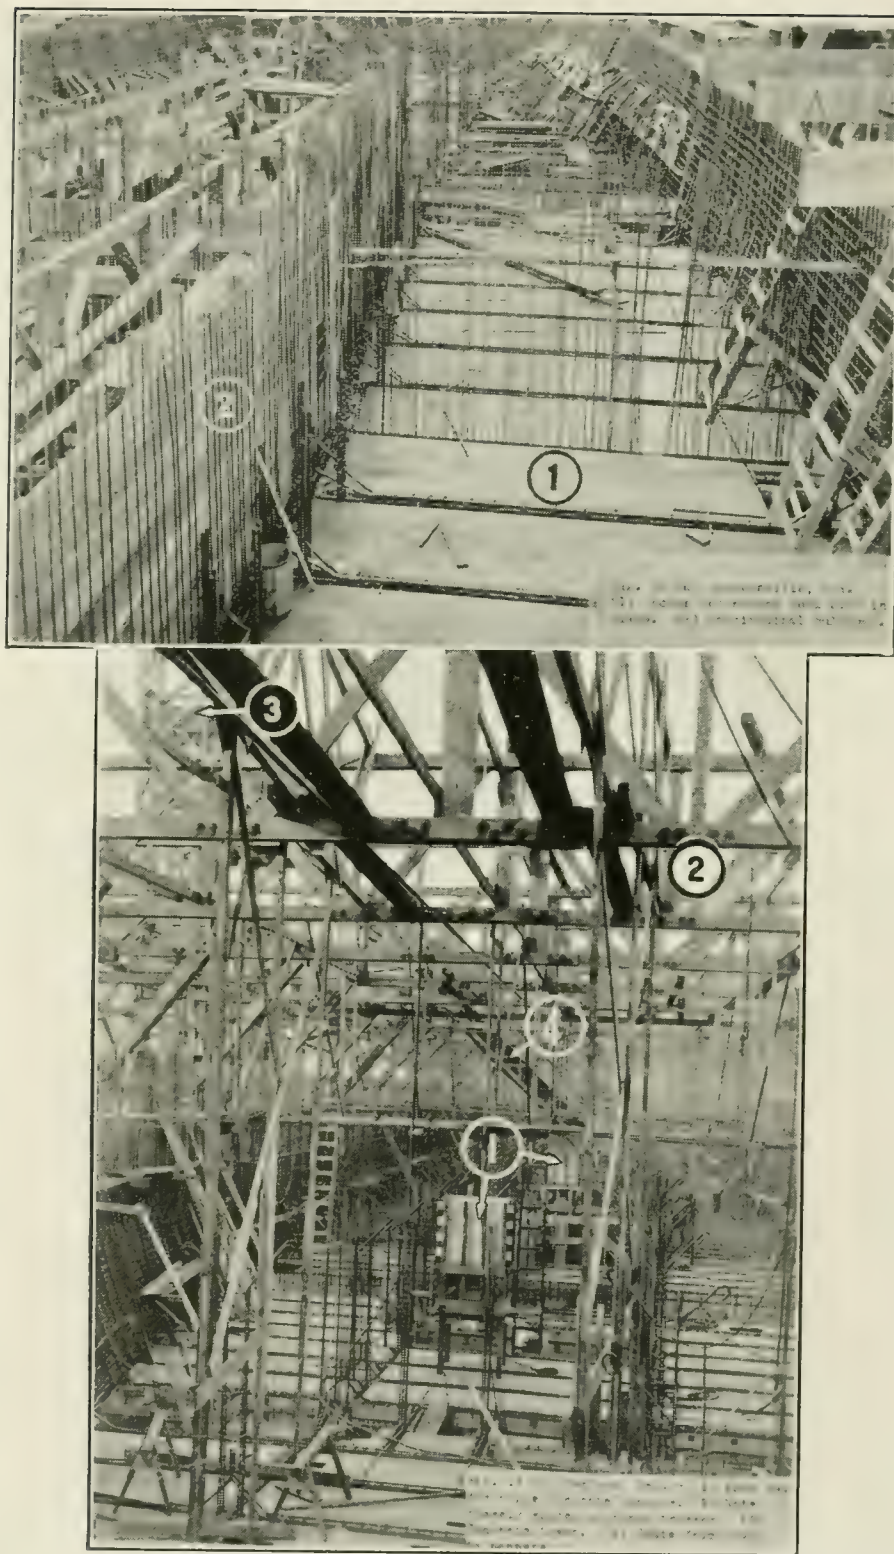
FORMS FOR THE SECOND DECK APPEAR AND SLABS PLACED.
